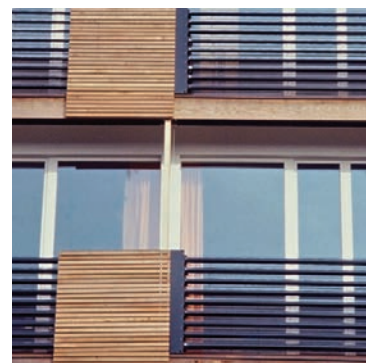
Evacuated tubes installed as balcony parapets at Sunny Woods, Beat Kämpfen, Zurich, 2001
